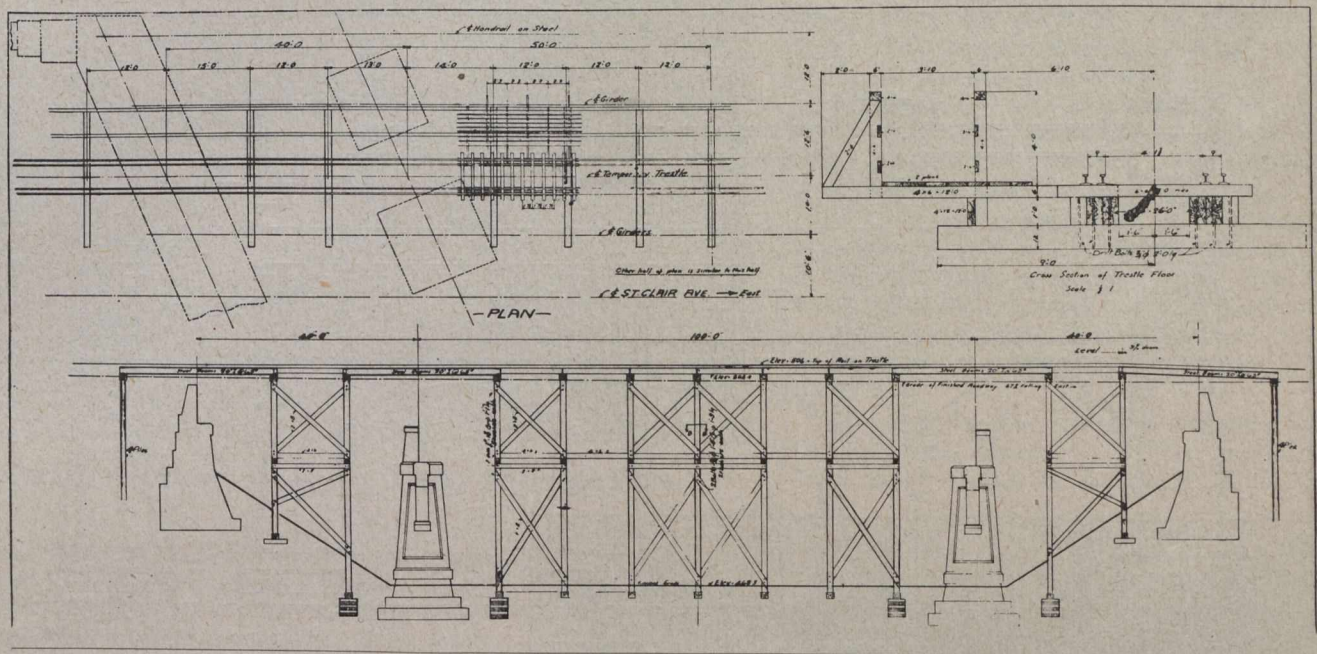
Temporary Timber Trestle to Carry Car Line During Construction.
